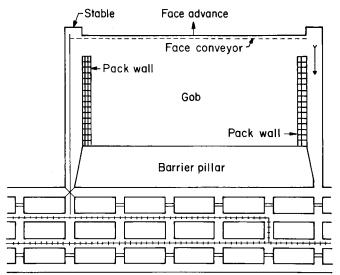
Advancing longwall trial at Dutch Creek No. 1 Mine in Colorado.
